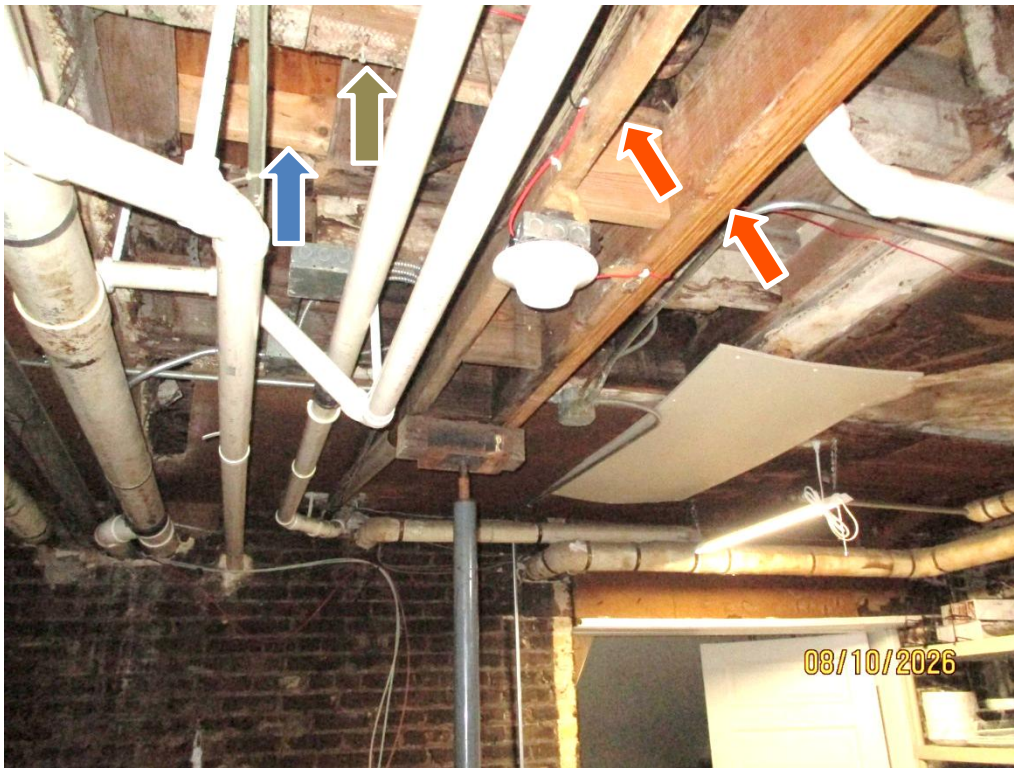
Structural layers and pipe congestion above shoring. Orange arrows indicate supplemental framing. Green arrows indicate the original construction framing, and the blue arrow indicates the top layer of floor framing.
